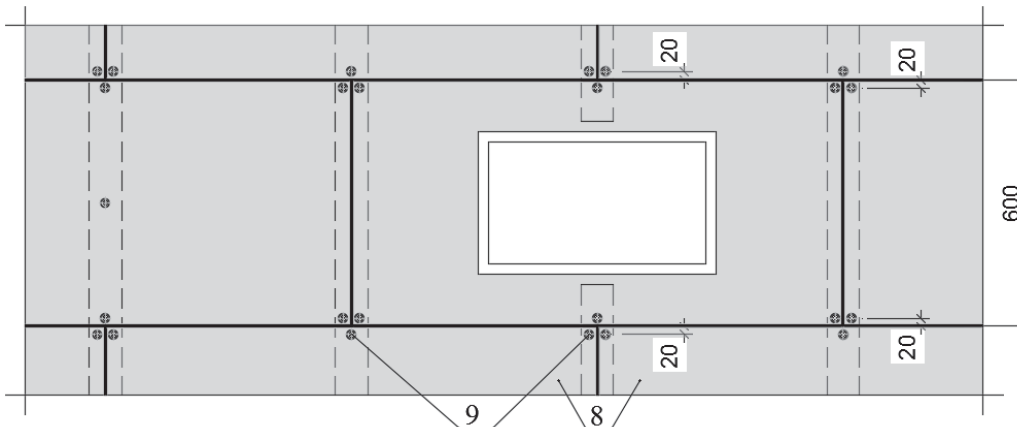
CEWOOD acoustic panel ceiling – installation of maintenance openings
